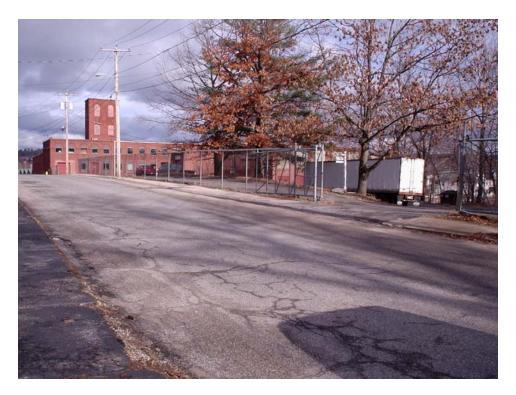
Norwood Street Site Facing Northeast – Existing Facilities in Operation.
